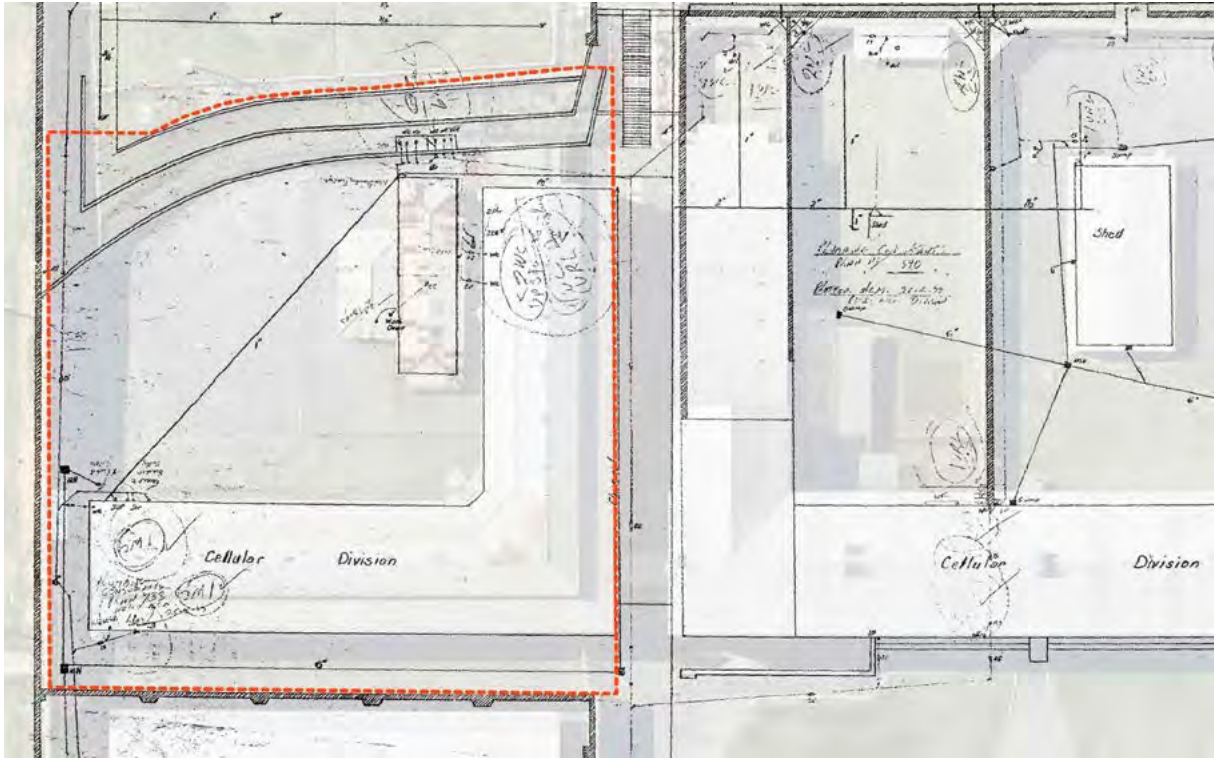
The site plan from 1900 shows an additional structure that is not evident in previous or subsequent plans. That building still stands.
